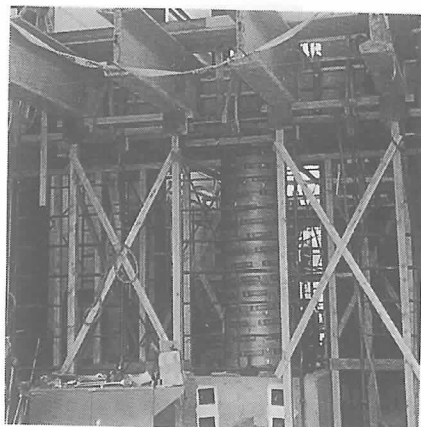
Experiment on prefabrication and earthquake-proofing system of highway structures in USCD
